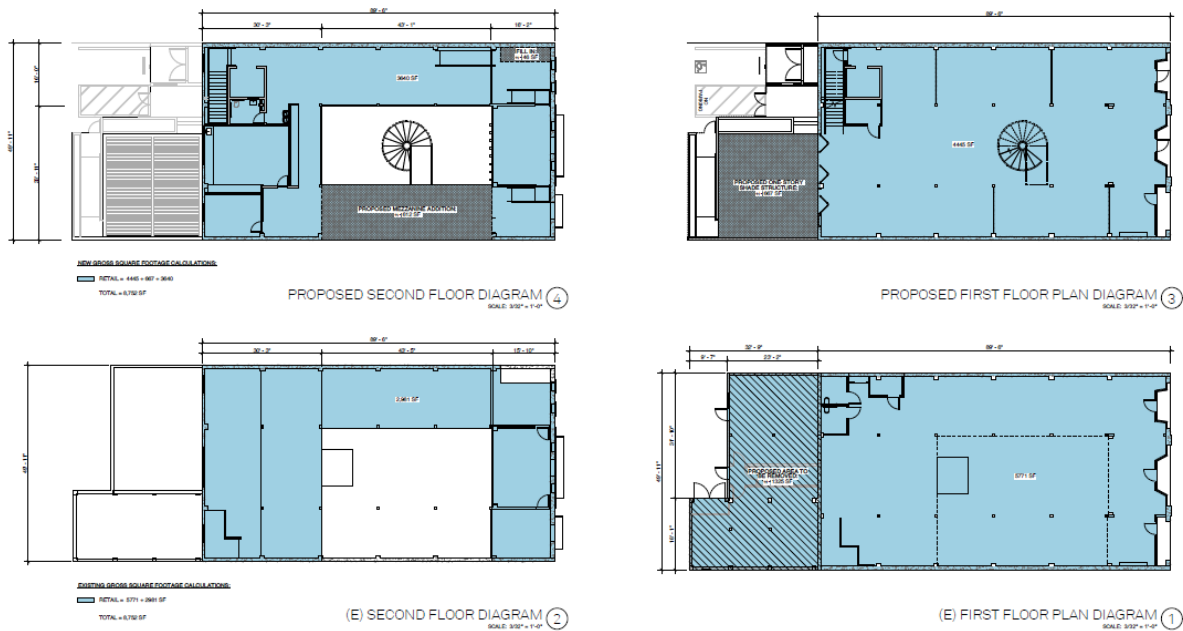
Existing (bottom) and proposed (top) floor plan diagrams.
